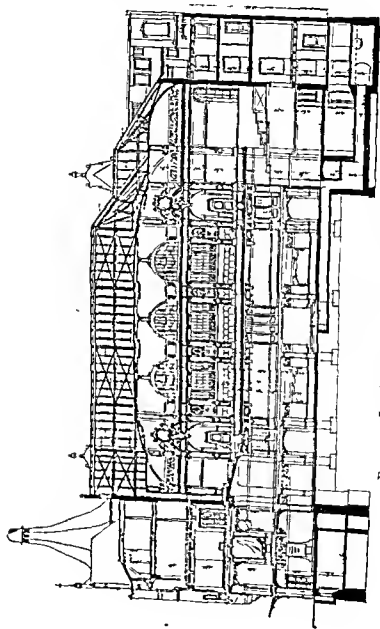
Longitudinal Section, Concert Hall, Strasburg.
